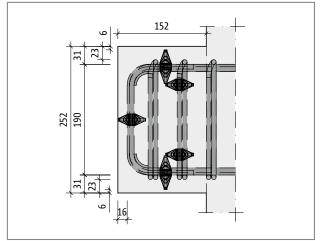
Schöck Tronsole® type Z: Plan view of a concrete landing with integrated load-bearingelement
